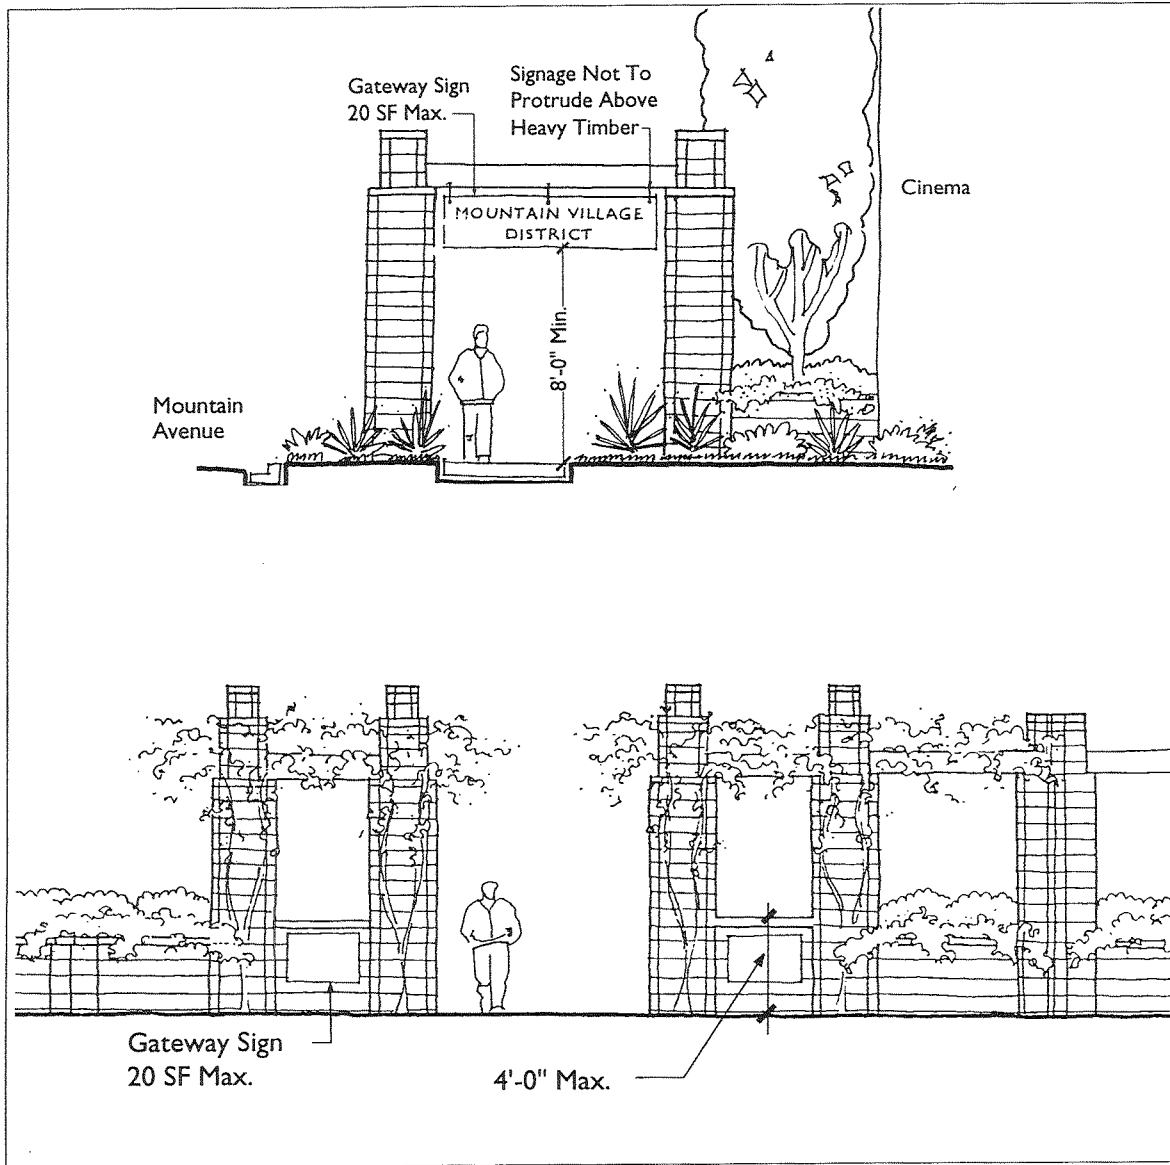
, Gateway Signs at Mountain and Freeway, and at Sixth Street Gateways. Gateway signage will serve as an important identification feature for persons and motorists entering the Mountain Village area. Attractive pylons will make the entry a memorable place and will tie into the Village Wall. These signs shall announce the Mountain Village District; project and tenant names shall not appear on these signs.
